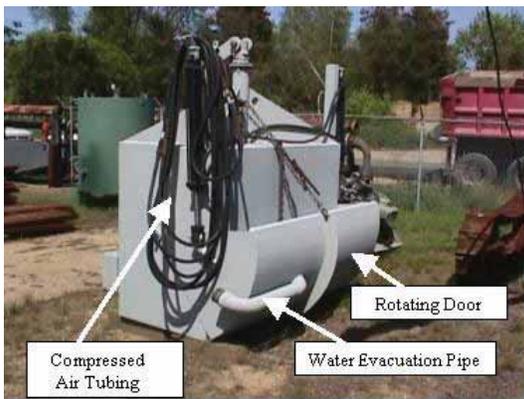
Pressure Controlled Excavator: Compressed Air Hosing and Rotating Door
